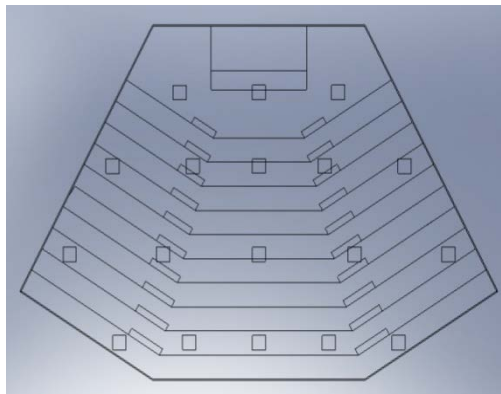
Layout plan for DK3 with diffusers and return air duct.
